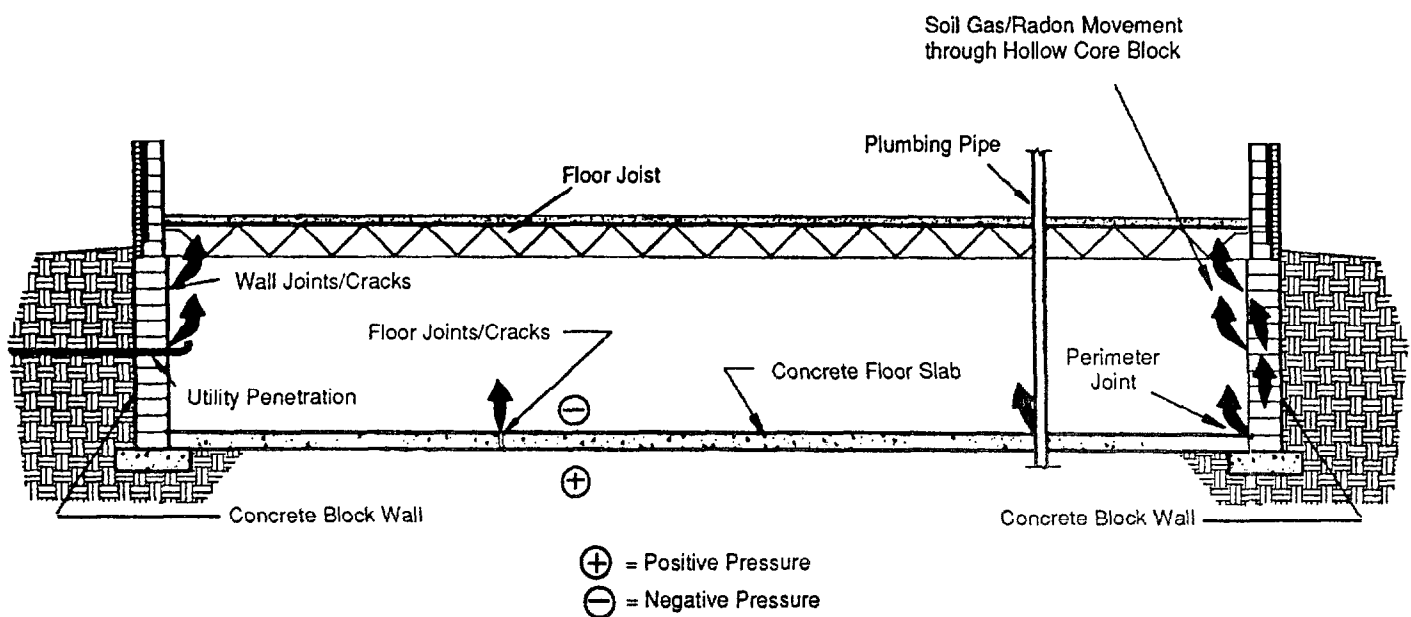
Typical radon entry routes in concrete block basement walls.
